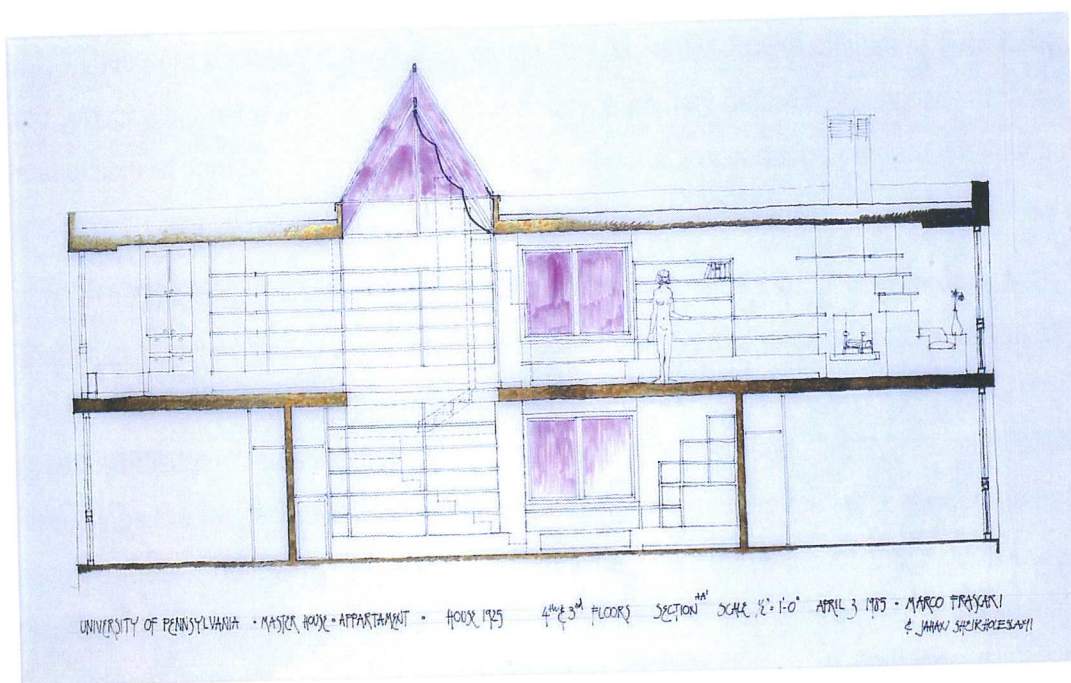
Master's Apartment in the House of 1925, Sketch Design, Section
